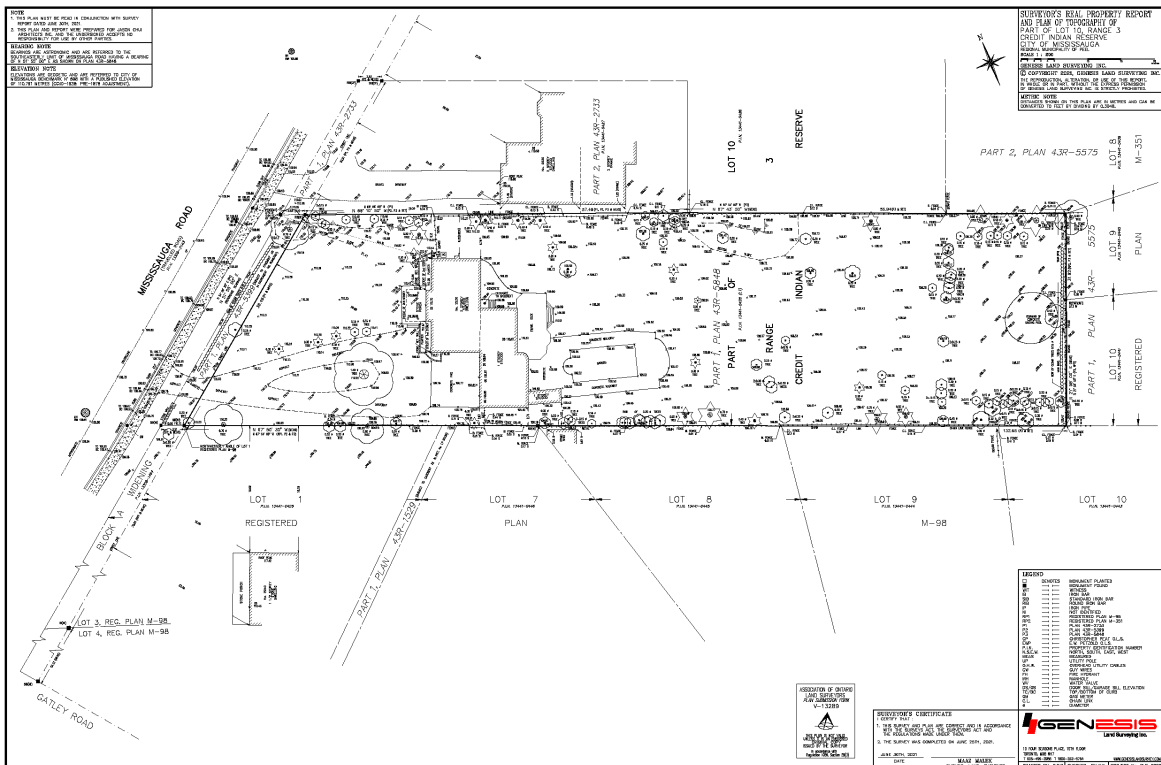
Proposed development including landscape details, 2230 Mississauga Road. (Image from client.)
